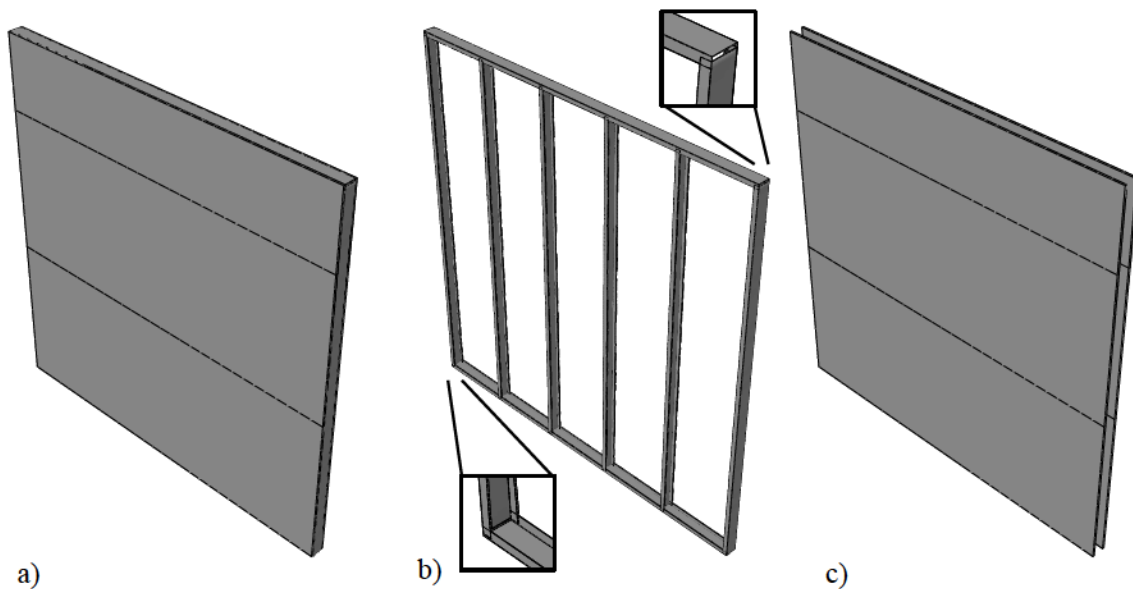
Cold-formed steel assembly, a) wall, b) CFS frame and c) sheathing boards
